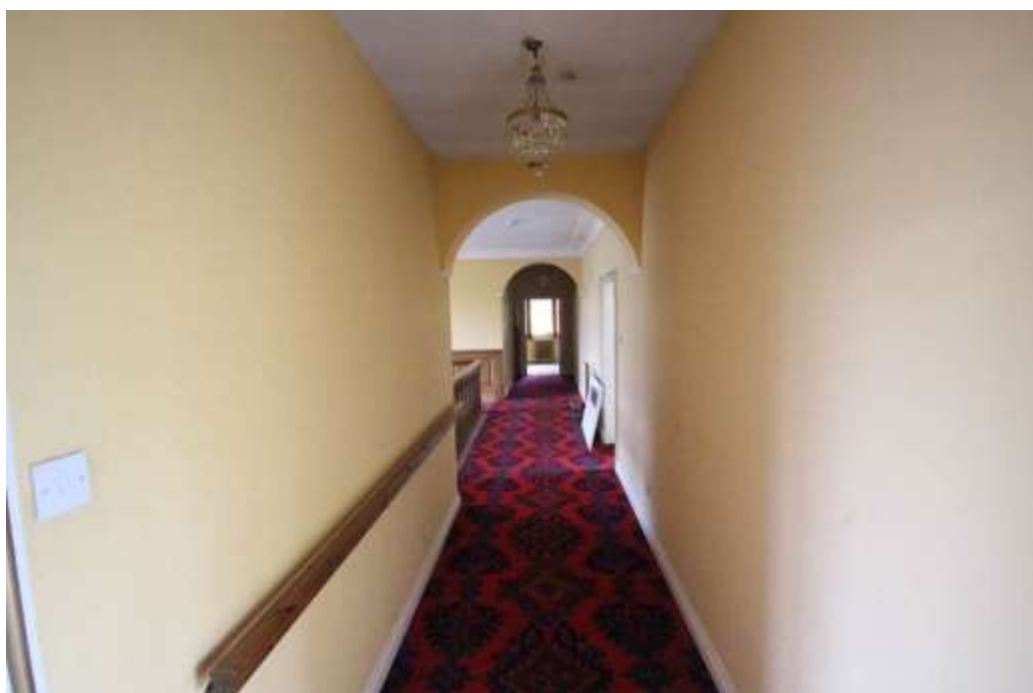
View of the first floor hallway, facing north towards the Galleried Landing.
